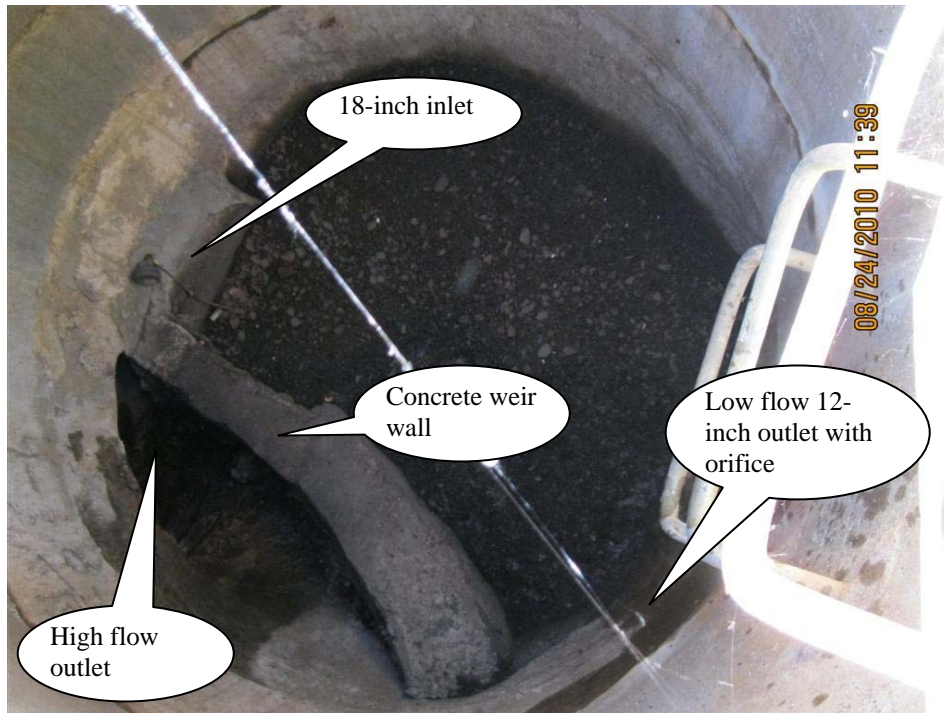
High-split flow manhole looking down. The weir wall is constructed to keep the water quality flow directed through an orifice and the 12-inch outlet. Once the flows exceed the water quality flow level, the water is directed over the weir wall and into the high flow outlet. This picture depicts substantial sediment which appears to be plugging the orifice of the low flow outlet pipe.
